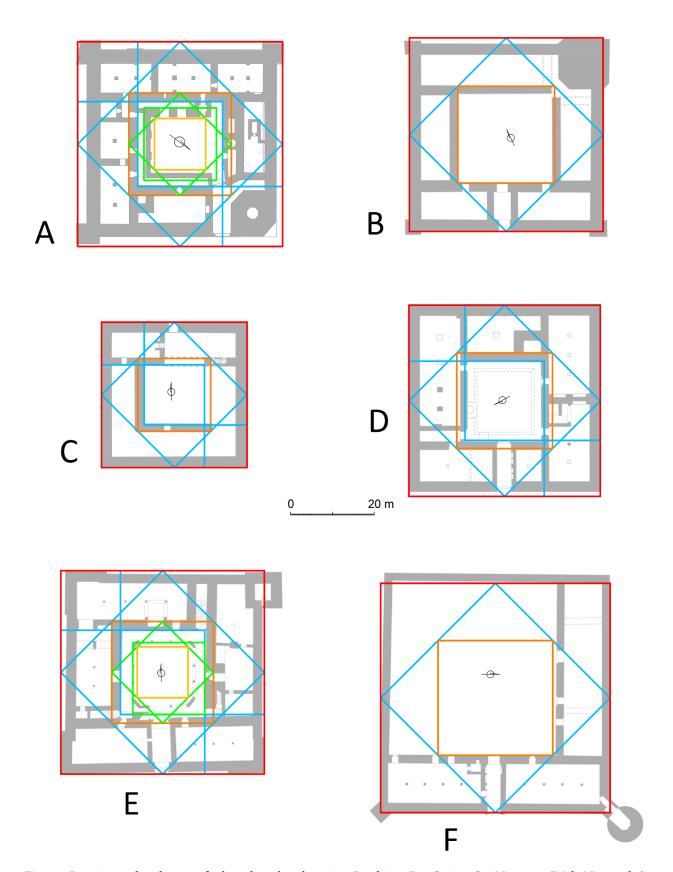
Drawings *ad qudratum* of selected castles plans: A – Brodnica, B – Gniew, C – Nieszawa (Mała Nieszawka), D – Ostróda, E – Lidzbark Warmiński, F – Barciany. Drawing B. Wasik. – *Abb. 10*. Aufzeichnung des Grundschemas in den Grundrissen der ausgewählten Objekte: A – Brodnica, B – Gniew, C – Nieszawa (Mała Nieszawka), D – Ostróda, E – Lidzbark Warmiński, F – Barciany. Zeichnung B. Wasik.
